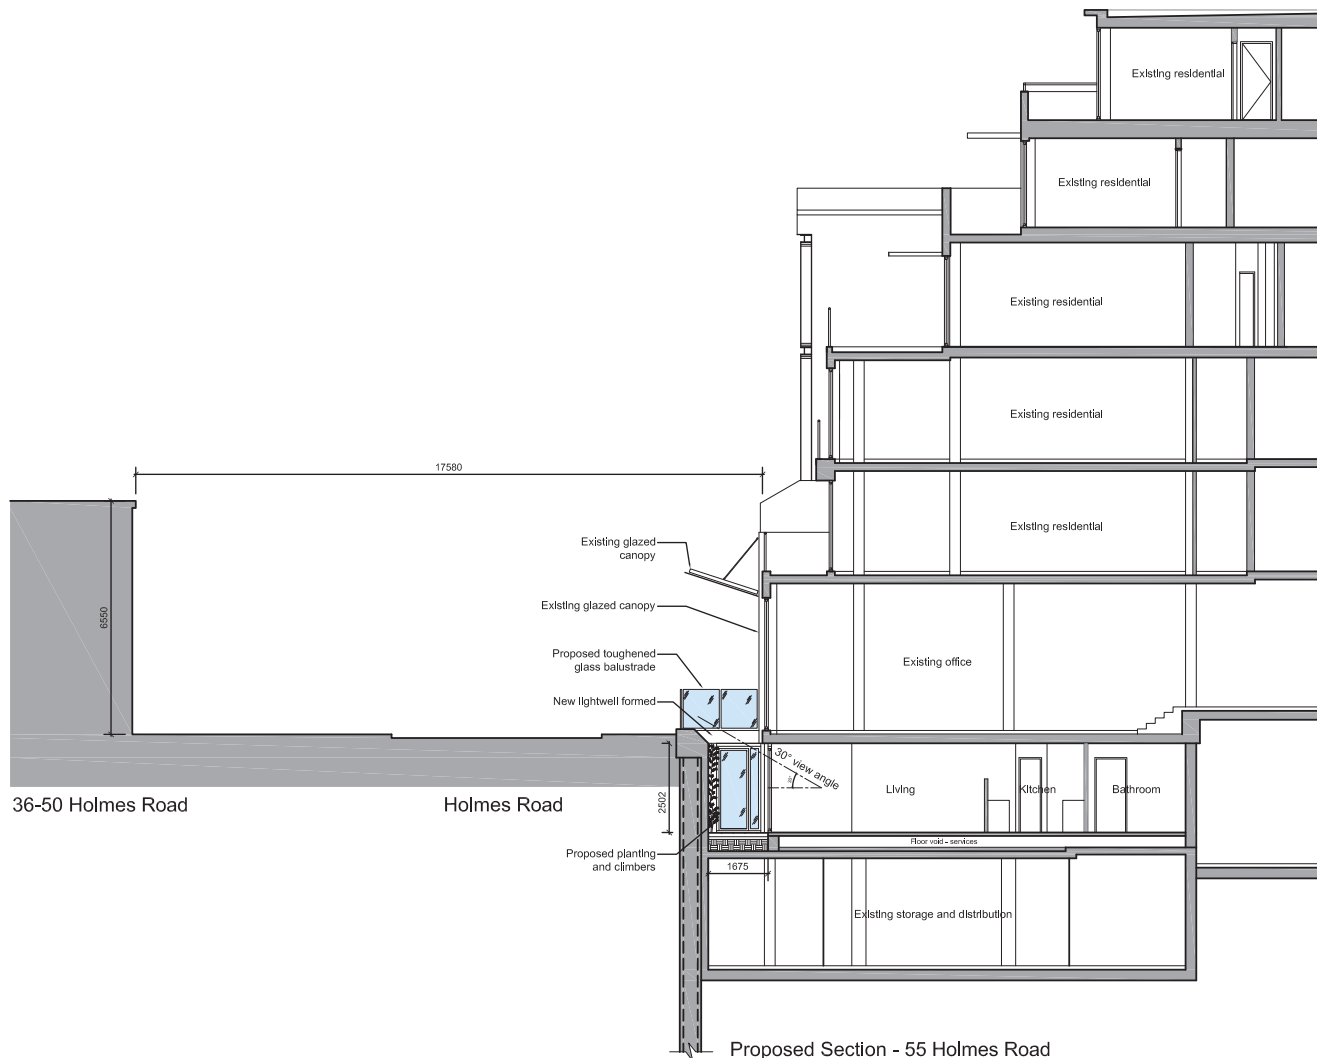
Holmes Road proposed section through upper basement flat and external lightwell / terrace
